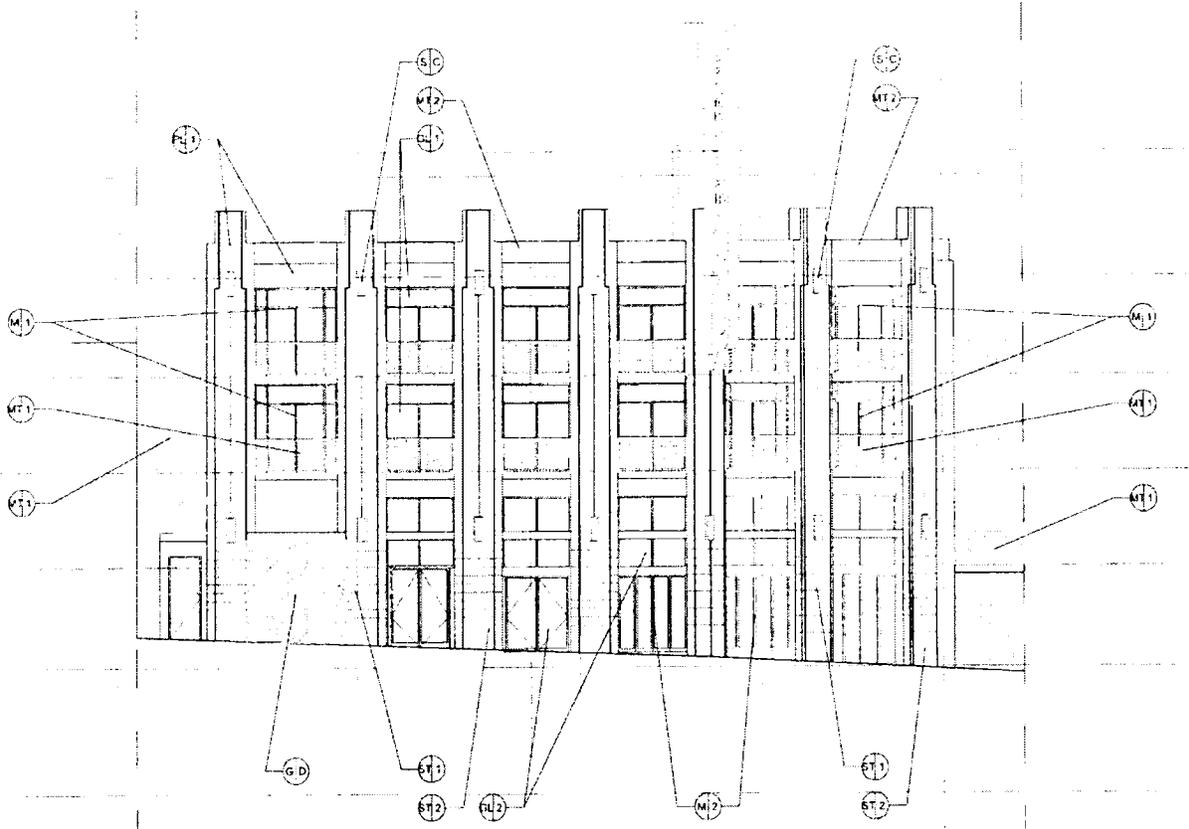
PROPOSED 1731 POWELL ST EAST (COLUMBUS AVENUE) ELEVATION
